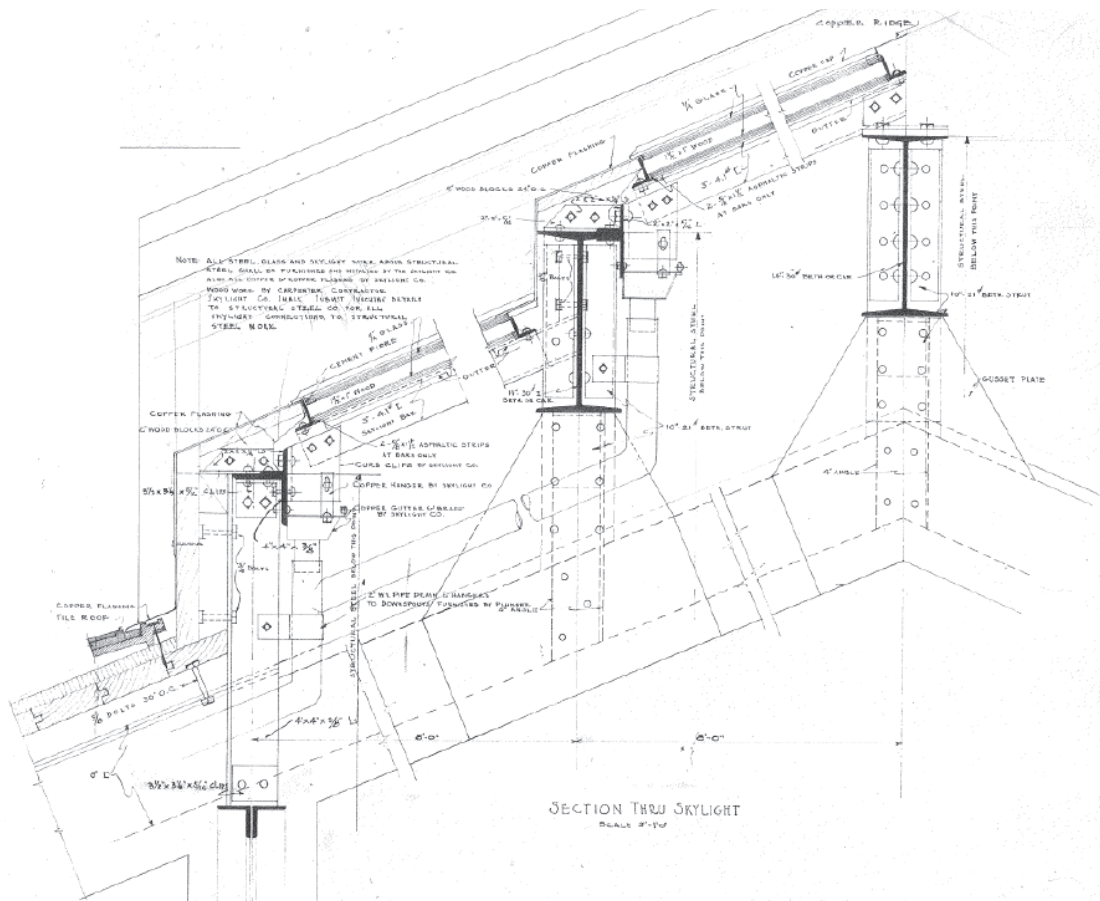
Skylight Framing (Original Construction Drawings 1929)
